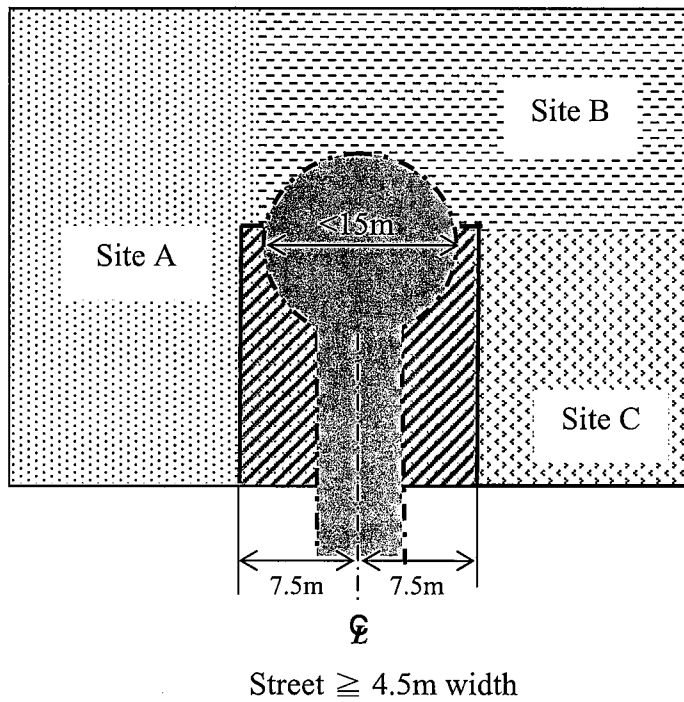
Example (4) of Building Setback – Site at the end of the street/ cul-de-sac
